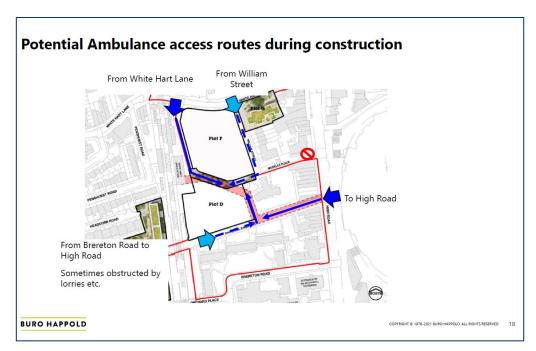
HRW Masterplan Construction Phasing – Potential Ambulance Access Routes
